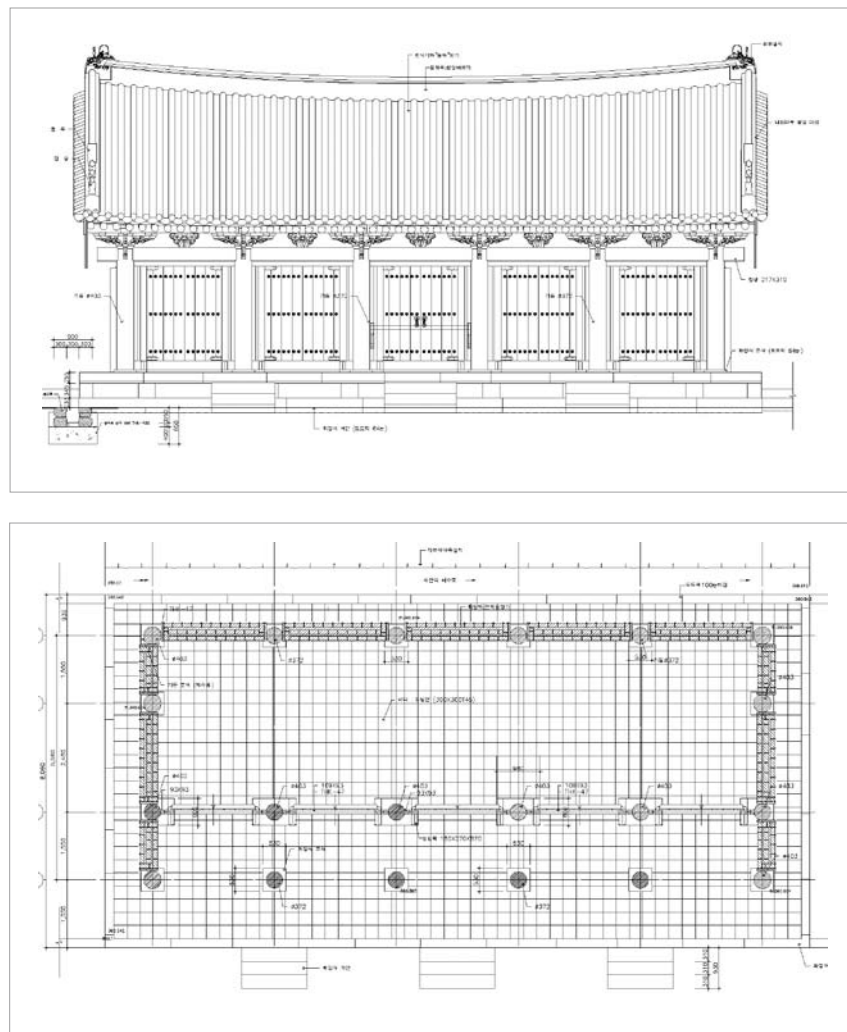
Drawing of Elevation and Plan for Shrine named Eternal Peace Reconstruction
